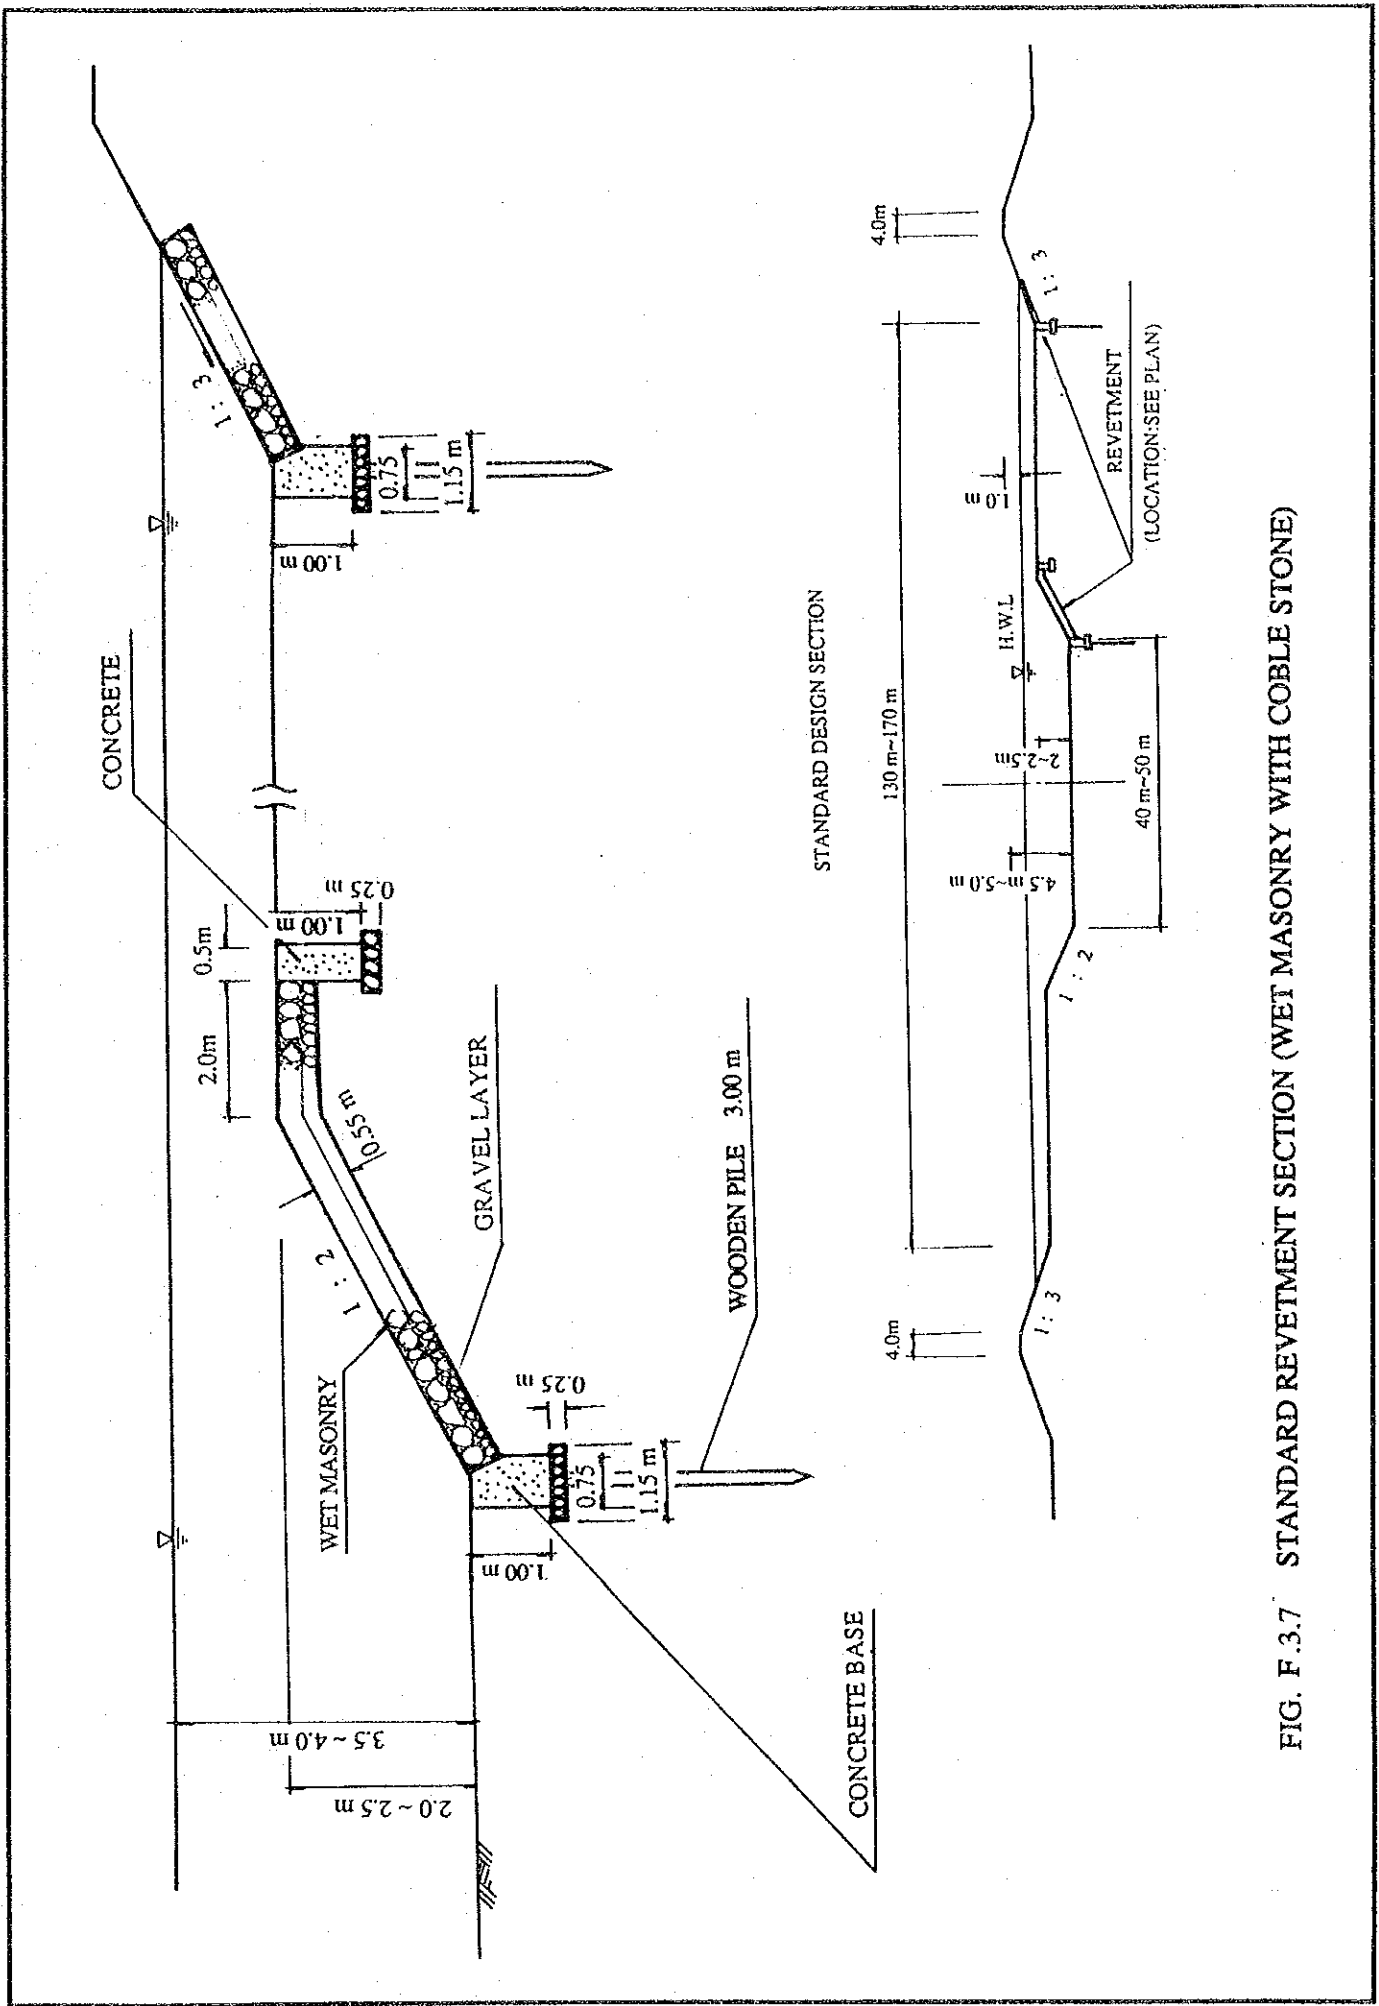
STANDARD REVETMENT SECTION (WET MASONRY WITH COBLE STONE)
